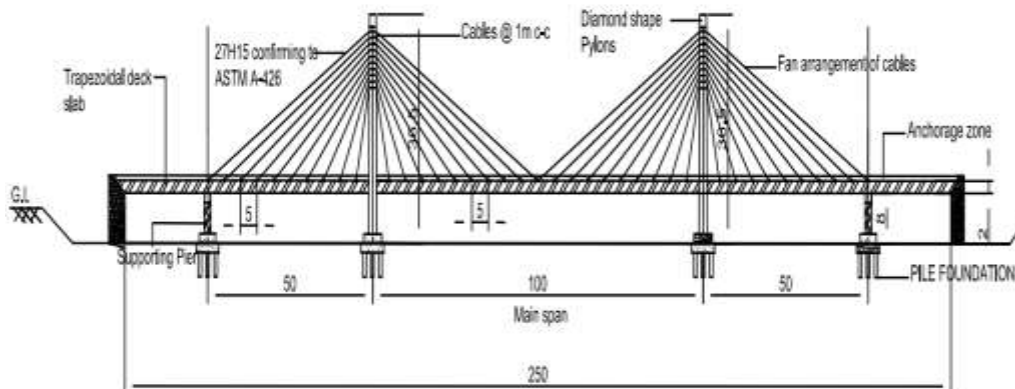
Longitudinal elevation of the cable stayed bridge.
